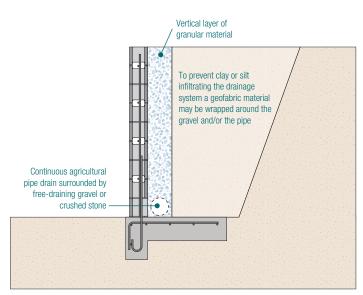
Continuous Drainage Within the Backfill Walls with Base Type 1
